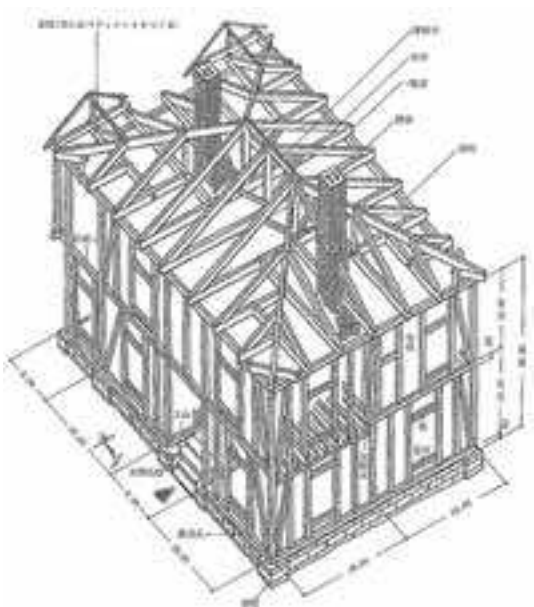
The original wooden-timber structure and chimney, all typical of US east coast non-seismic region, was restored. (credits: K. Masuda & O. Mendoza, 2011, edited from the conservation report 1998)
